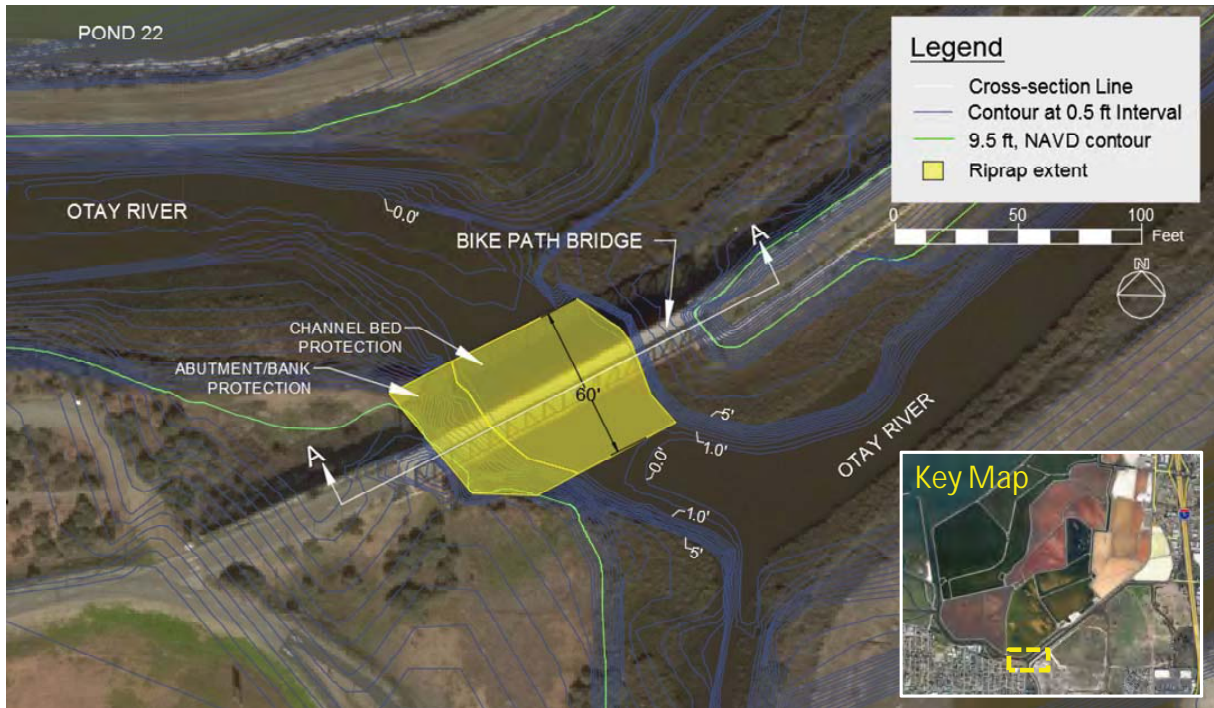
Conceptual Design for Revetment Protection at the South Bayshore Bikeway Bridge (Do Not Use for Construction)
